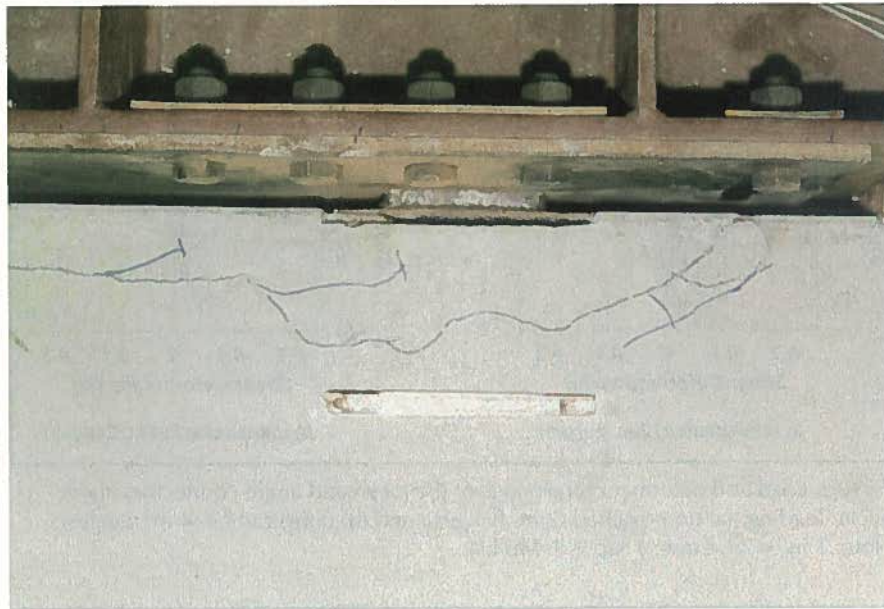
Typical crack pattern after slug welding and pre-opening of the joint; panels with a structural tee connector.
